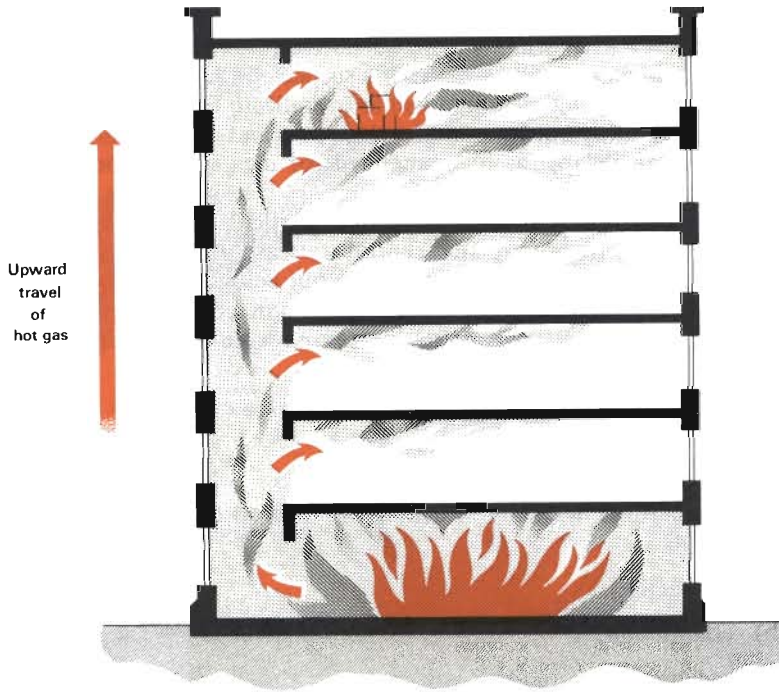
Sketch showing how fire on a lower floor can spread to upper floors by convection
